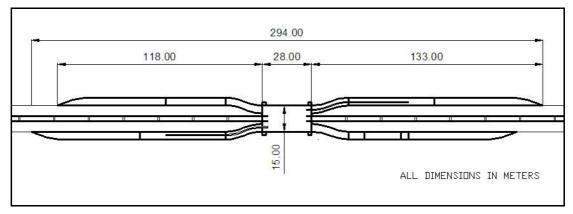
Top View On/off Switch Dimensions #1
